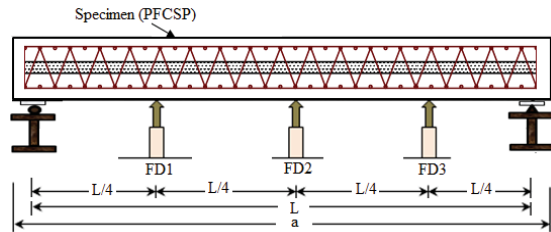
Details of LVDTs arrangement along the span of the test slab
